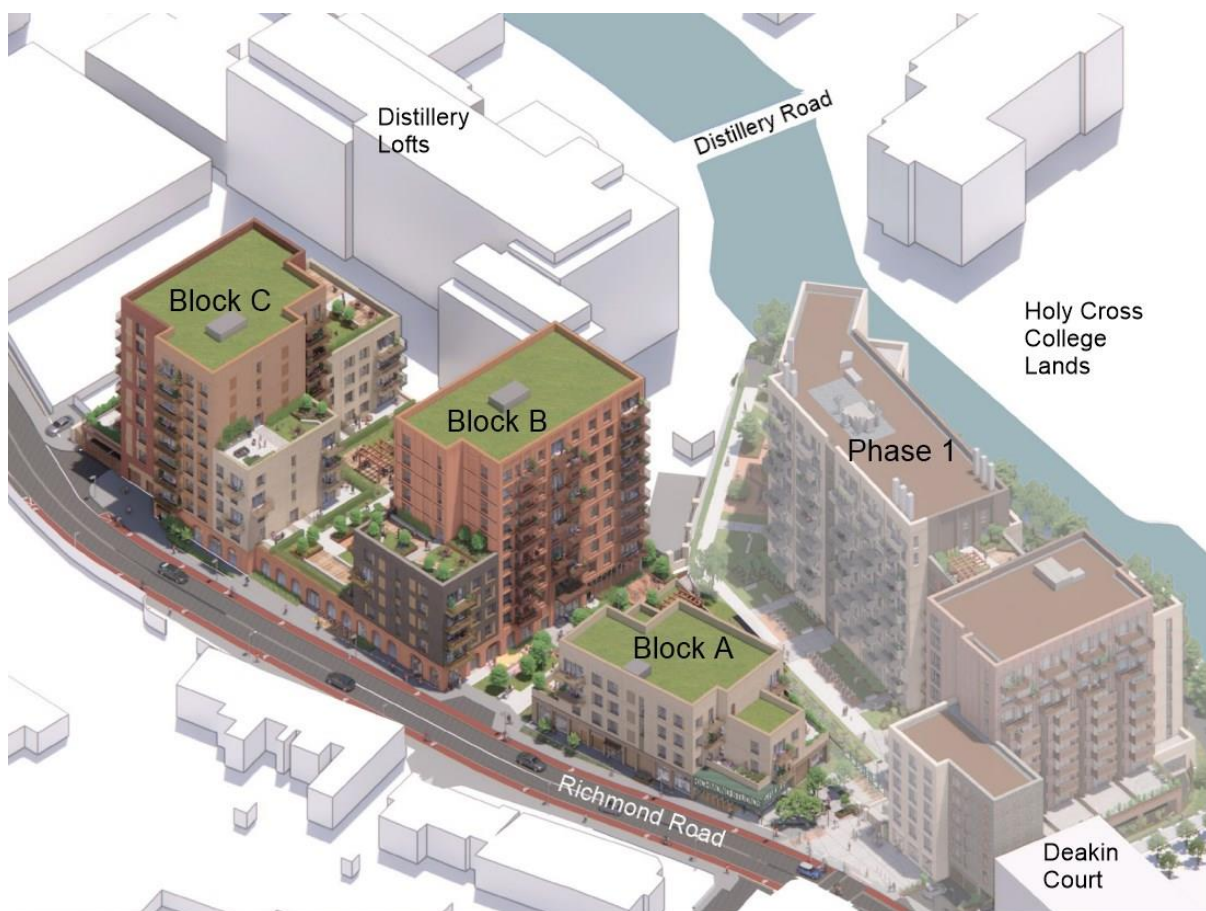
Aerial sketch of proposed scheme, viewed from the north (Source: RKD Architects). Note: the proposed Ph1 development, submitted for planning permission in 2021 and pending a decision, is shown faded out on the right. Existing buildings are blocked out in white.
